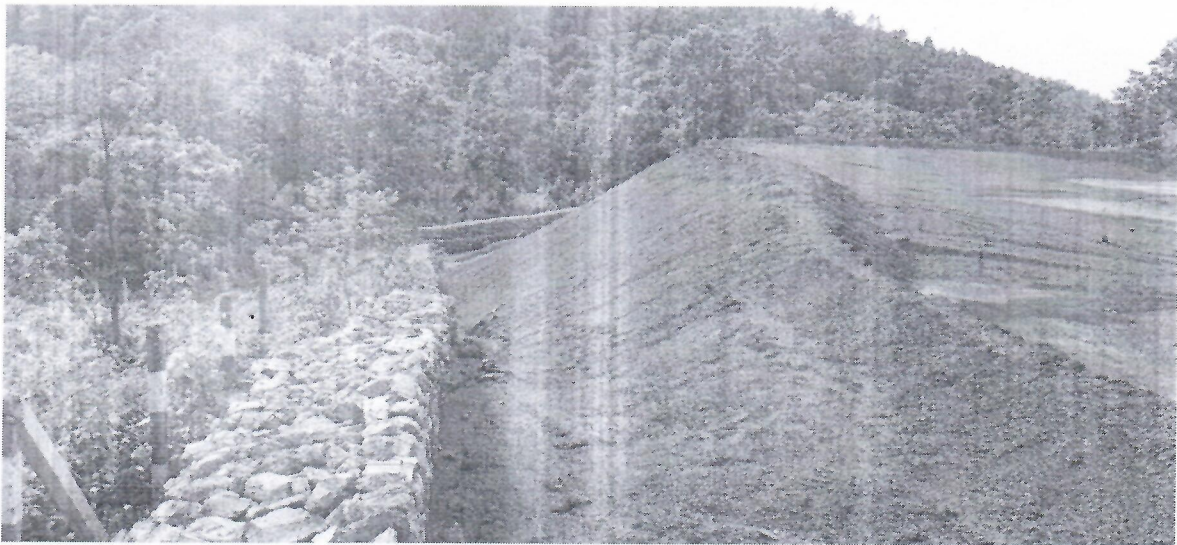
Showing Retaining wall & garland drain around OB Dumps
